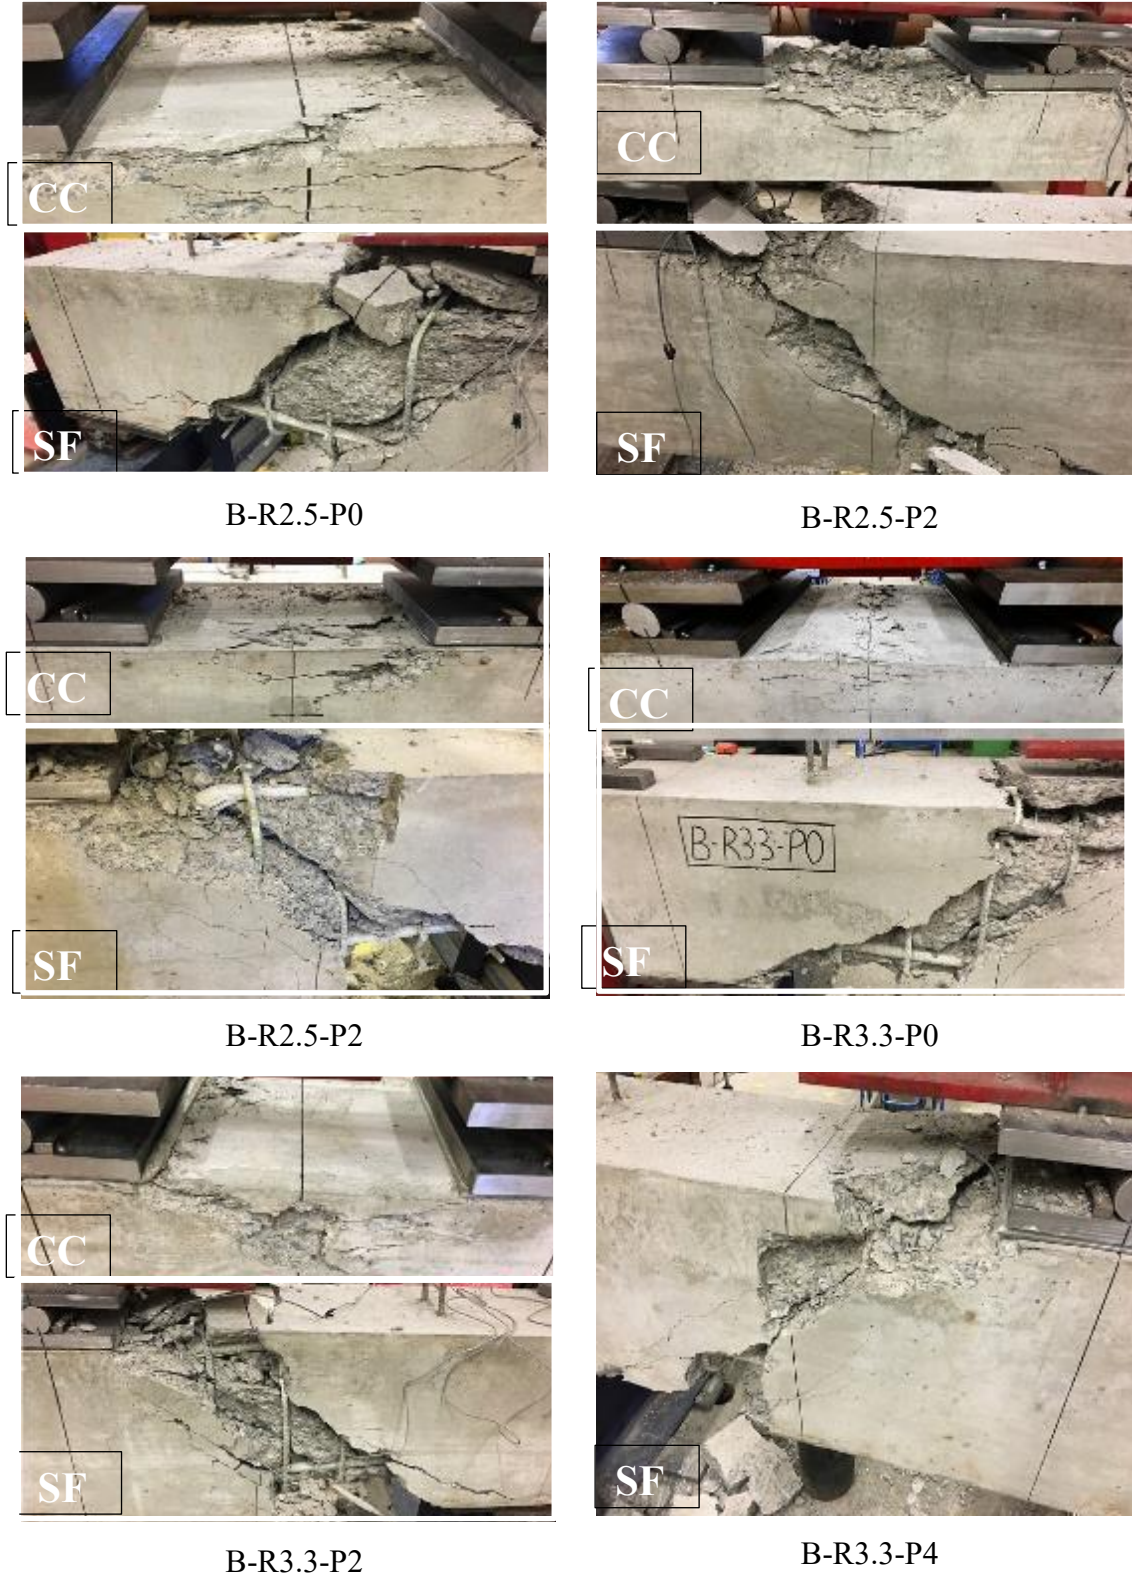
Failure Pattern – Beams with 2.5% and 3.3% Reinforcement Ratio
